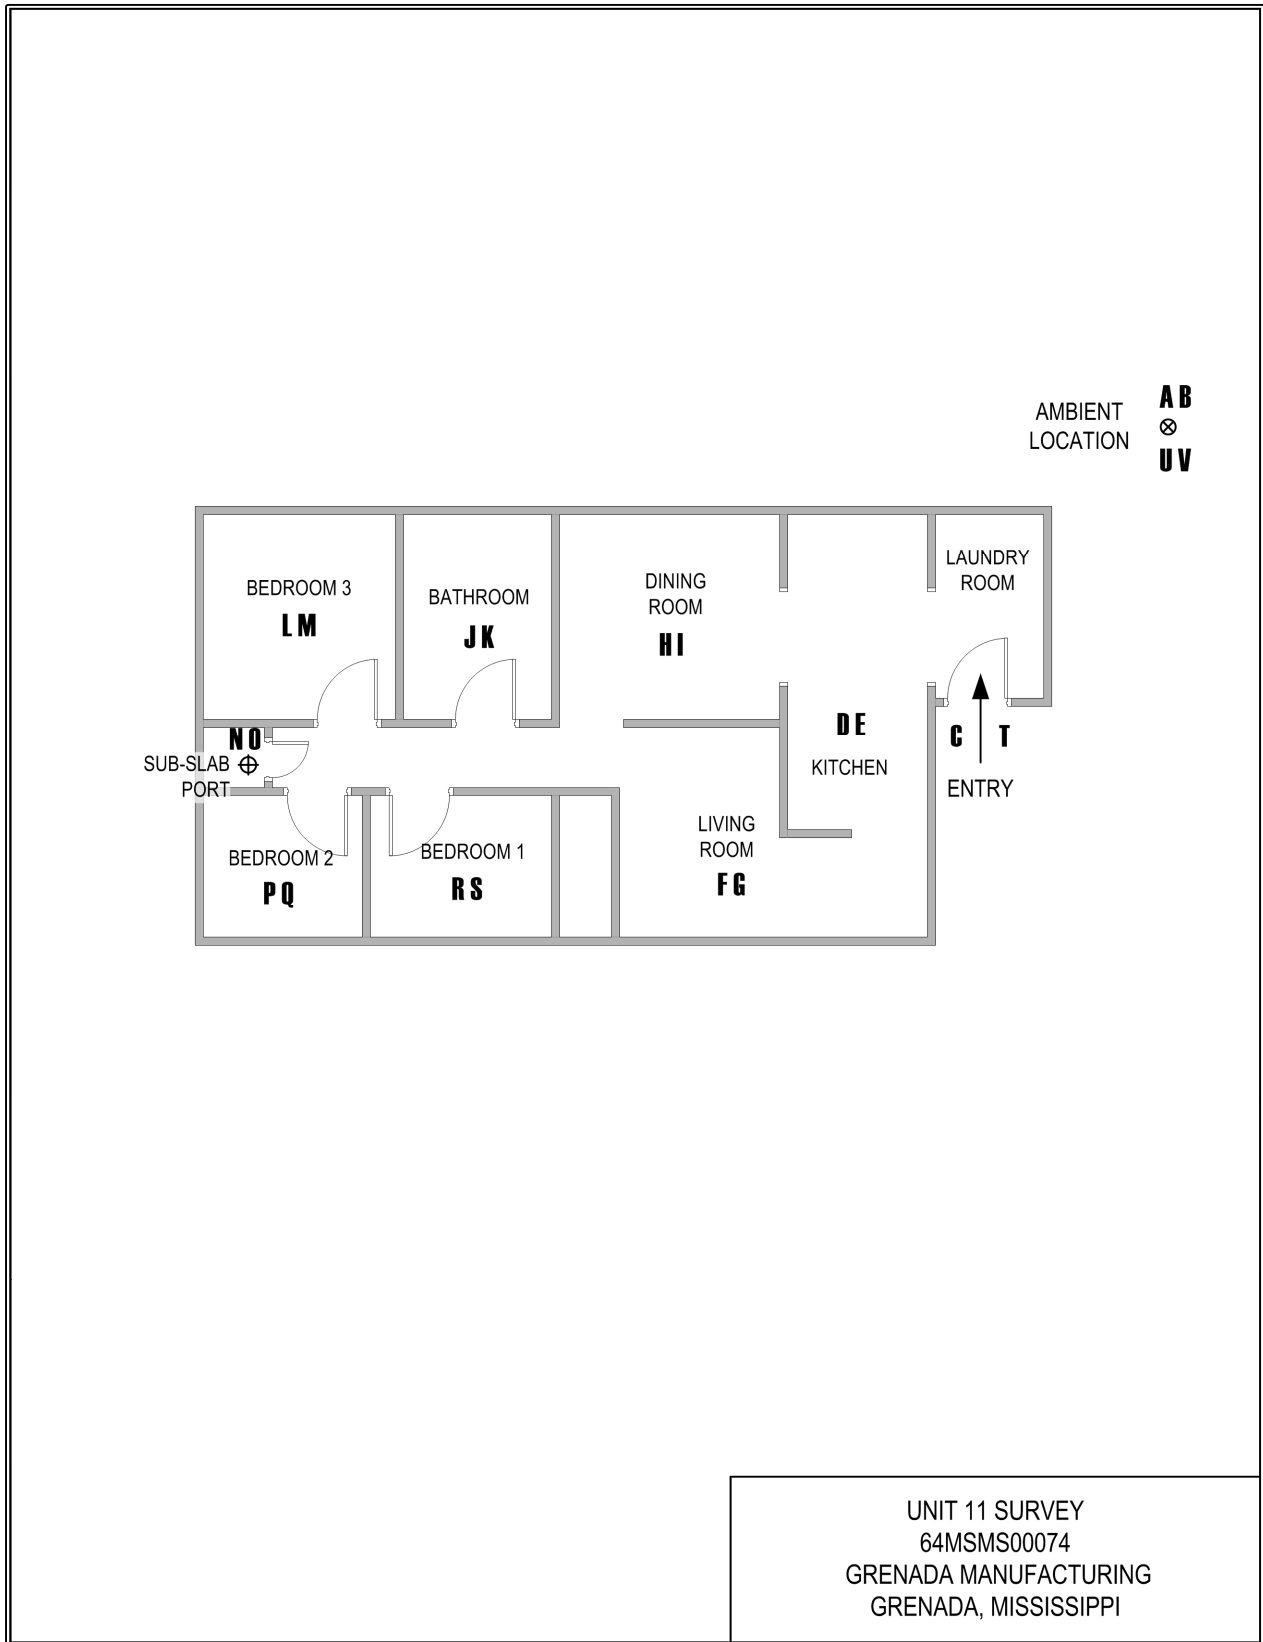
Unit 11 Survey Floor Plan, 64MSMS00074
